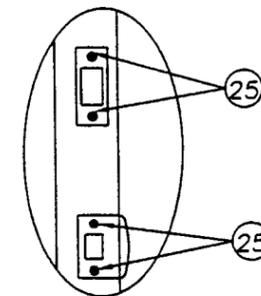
DETAIL F HEADER WINDJAMBER ASTRAGAL RETAINER BOLTS HEADER STRIKE PLATE & OPTIONAL SURFACE BOLT STRIKE PLATE
